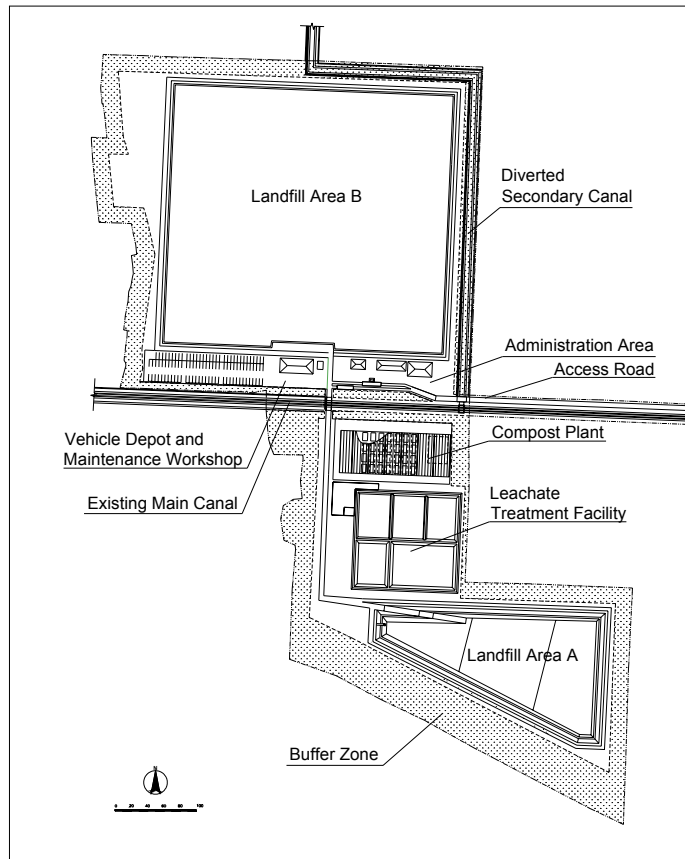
Layout Plan of the New Final Disposal Site in Dang Kor
